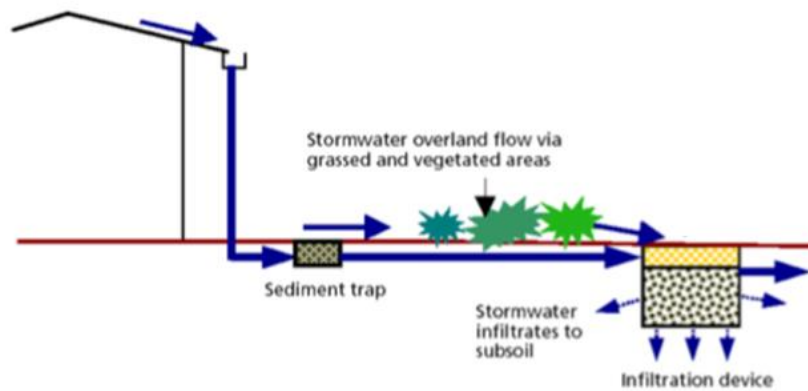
Typical Infiltration Trench (adopted from DPLG, 2009)
